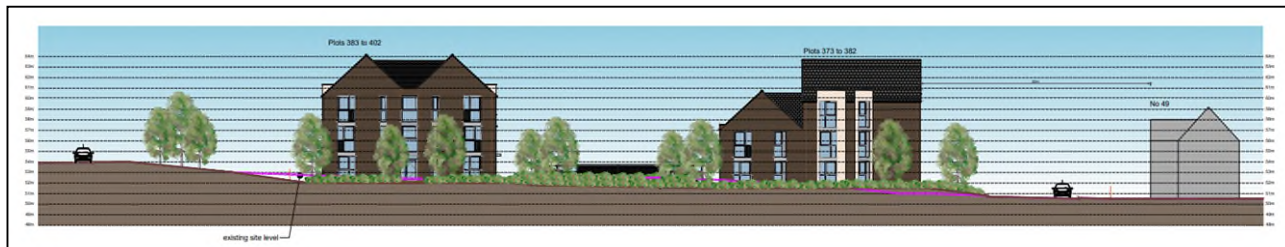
Cross Section showing relationship between Plots 373-382 and 49 Maesteg Road
